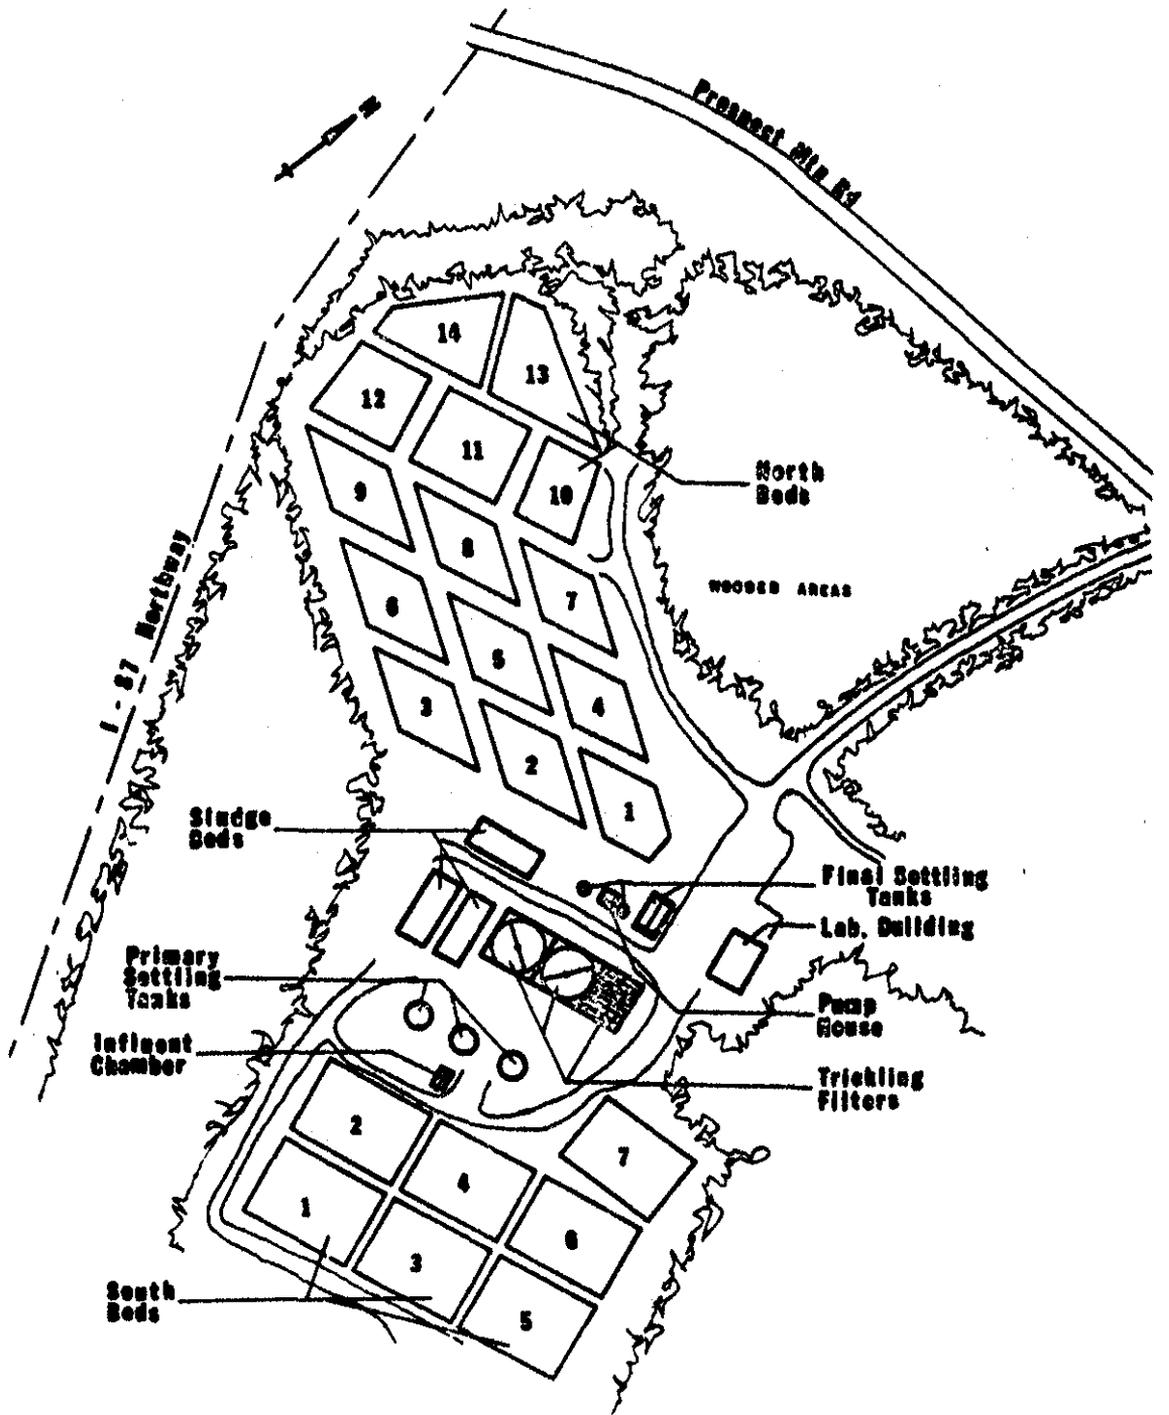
Plan of the Lake George Village Sewage Treatment Plant
